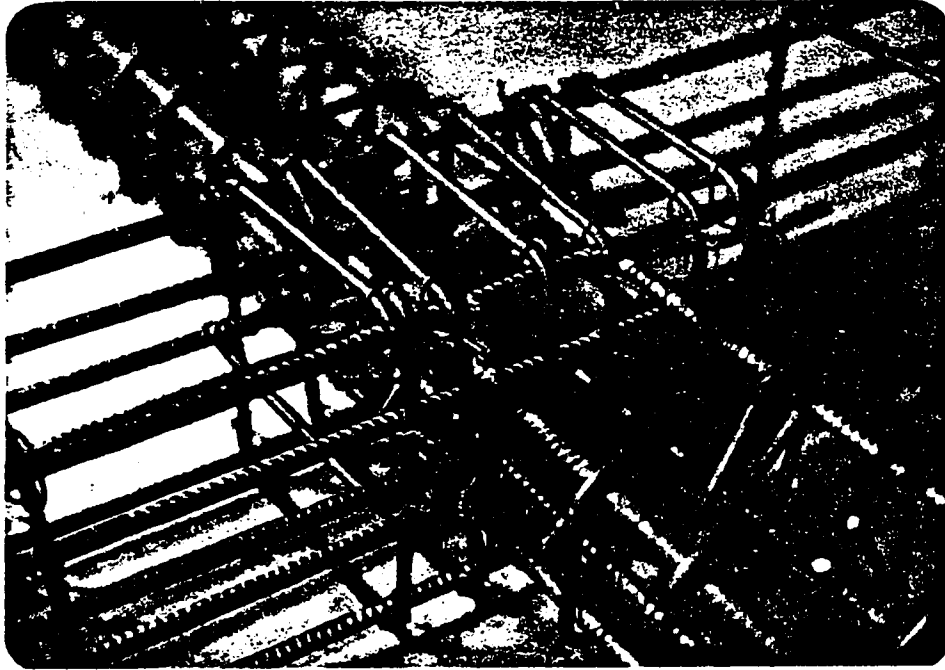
JOINT REINFORCEMENT, SPECIMENS 1,2
